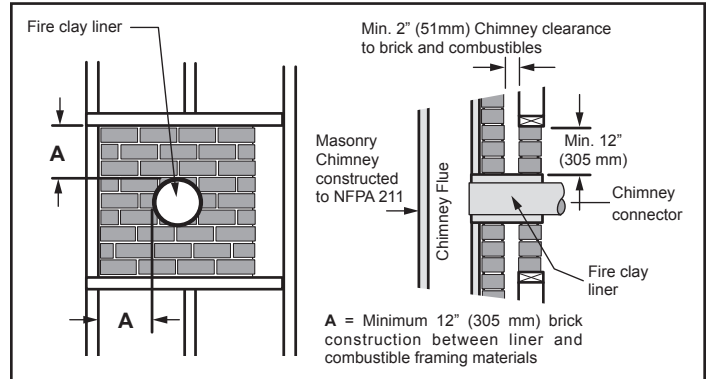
Masonry Wall Pass-through with single wall chimney connector.
